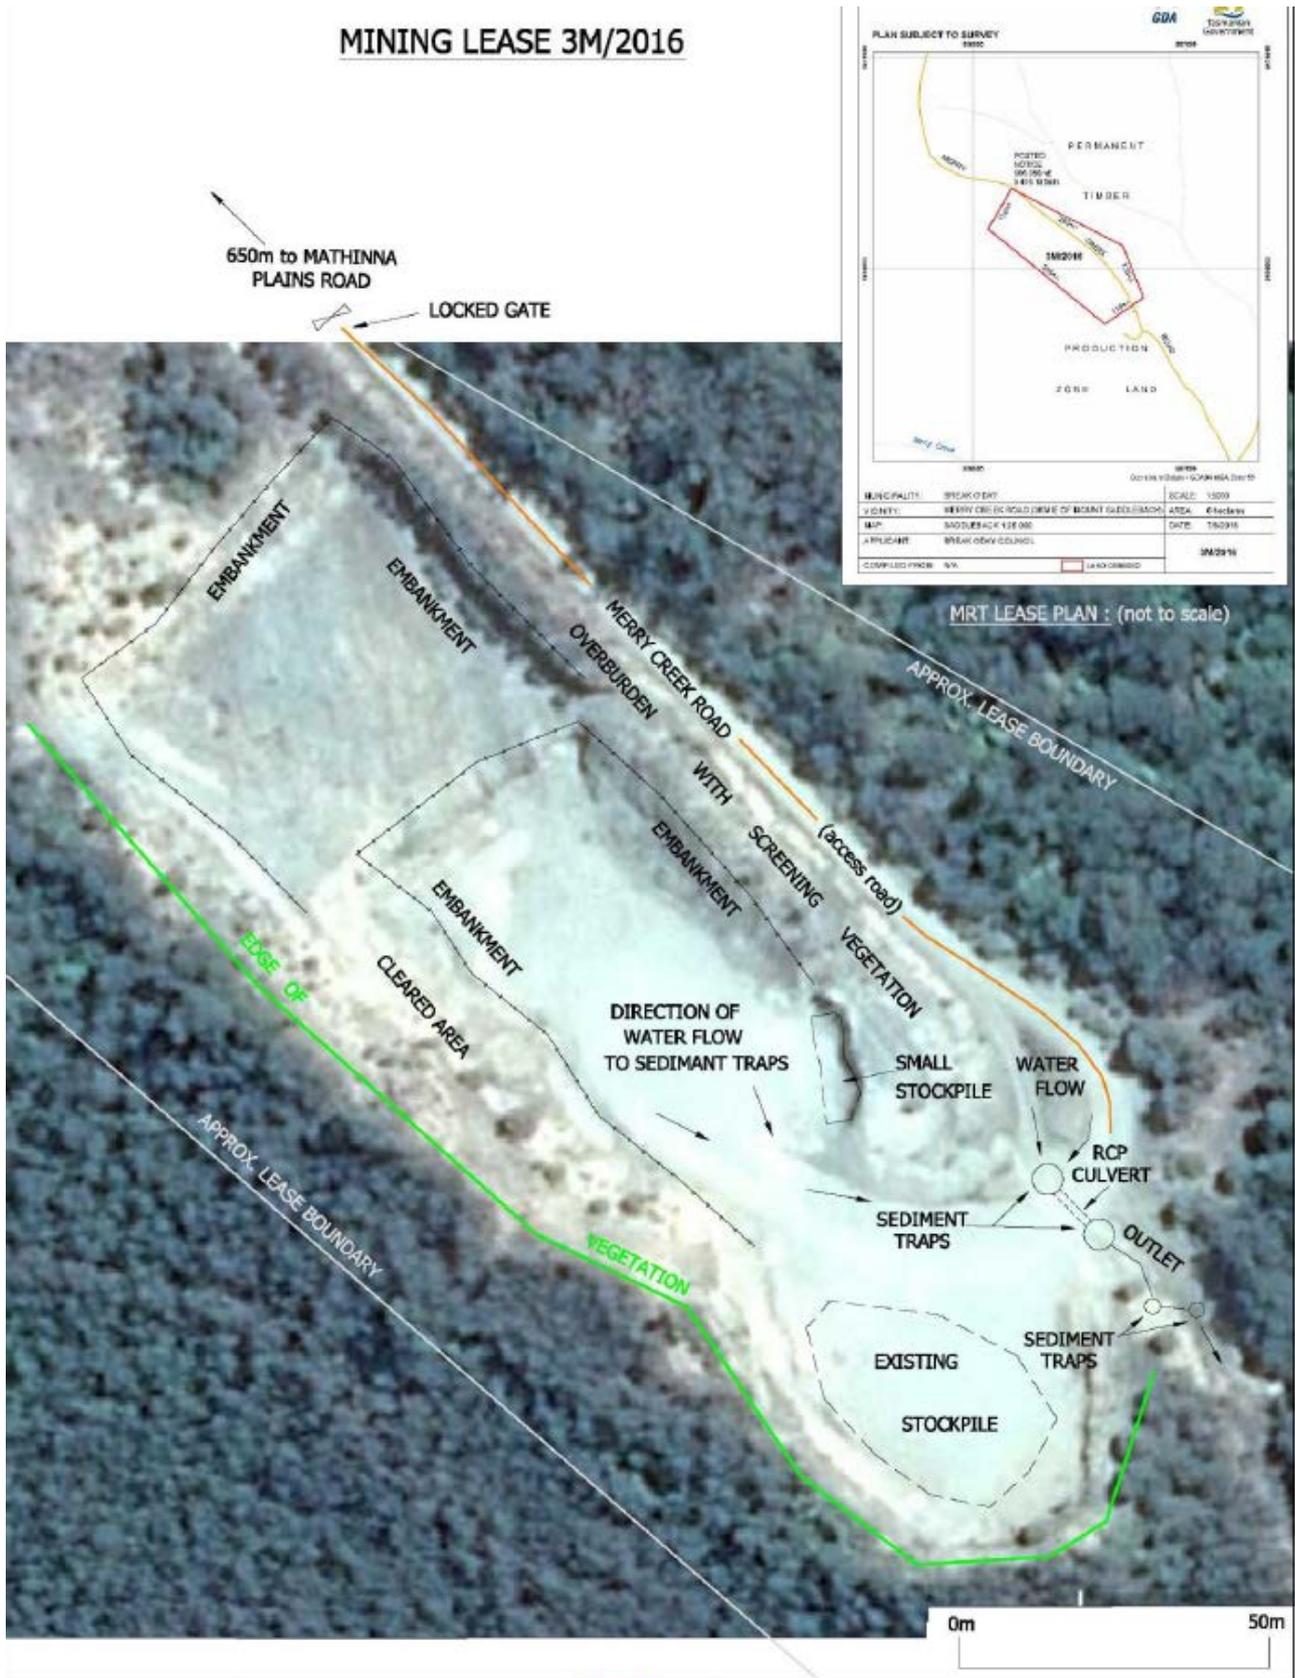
Mining/Site Plan (Figure B.2.4 of the EER).
